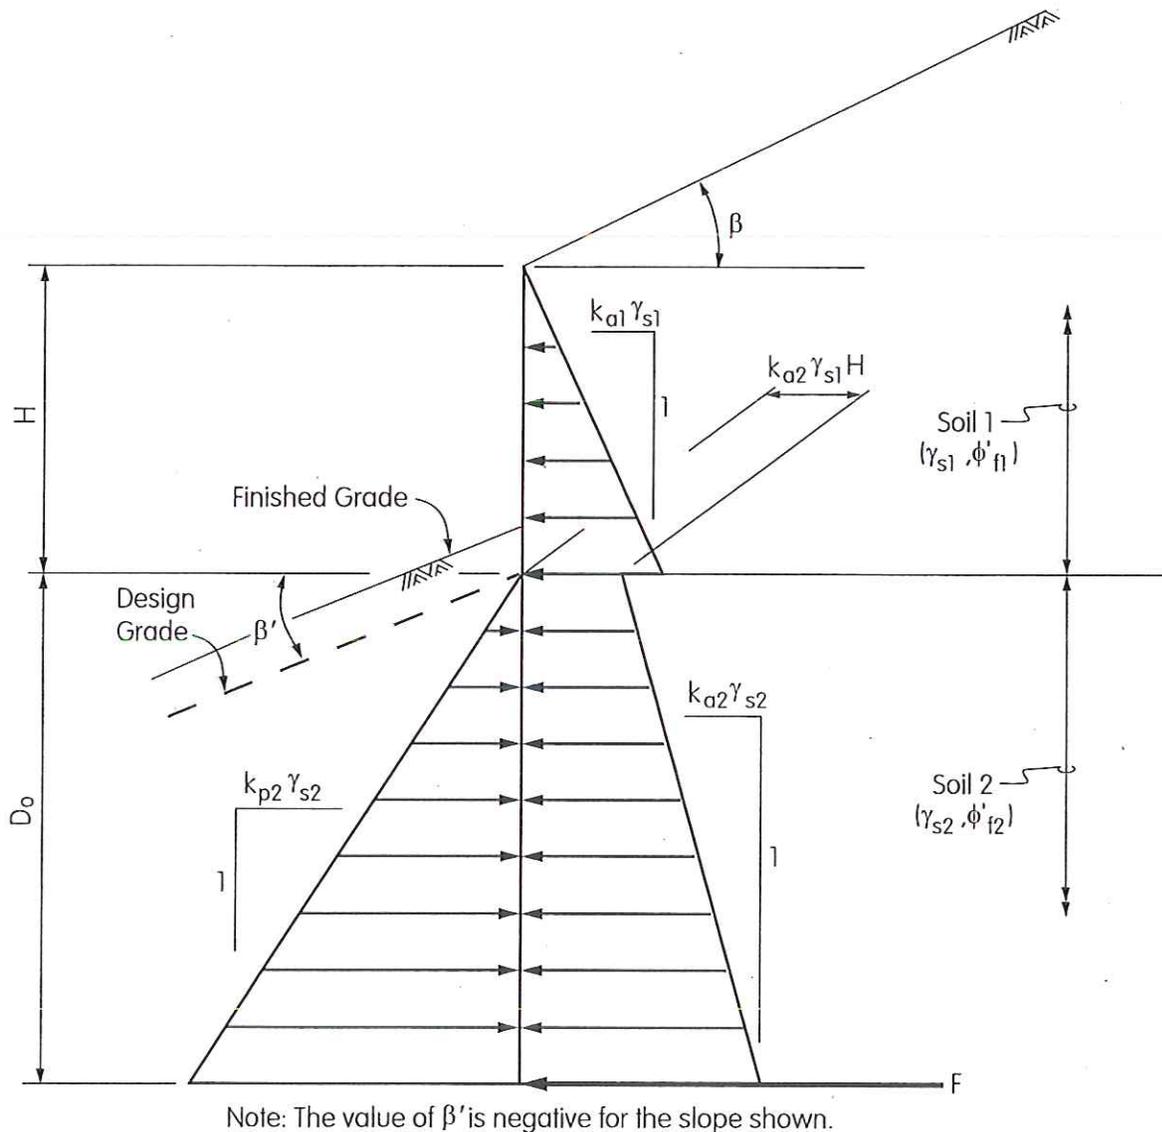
Simplified Lateral Earth Pressure Distributions for Permanent Non-gravity Cantilevered Walls with Vertical Wall Elements Embedded in Granular Soil and Retaining Granular Soil
